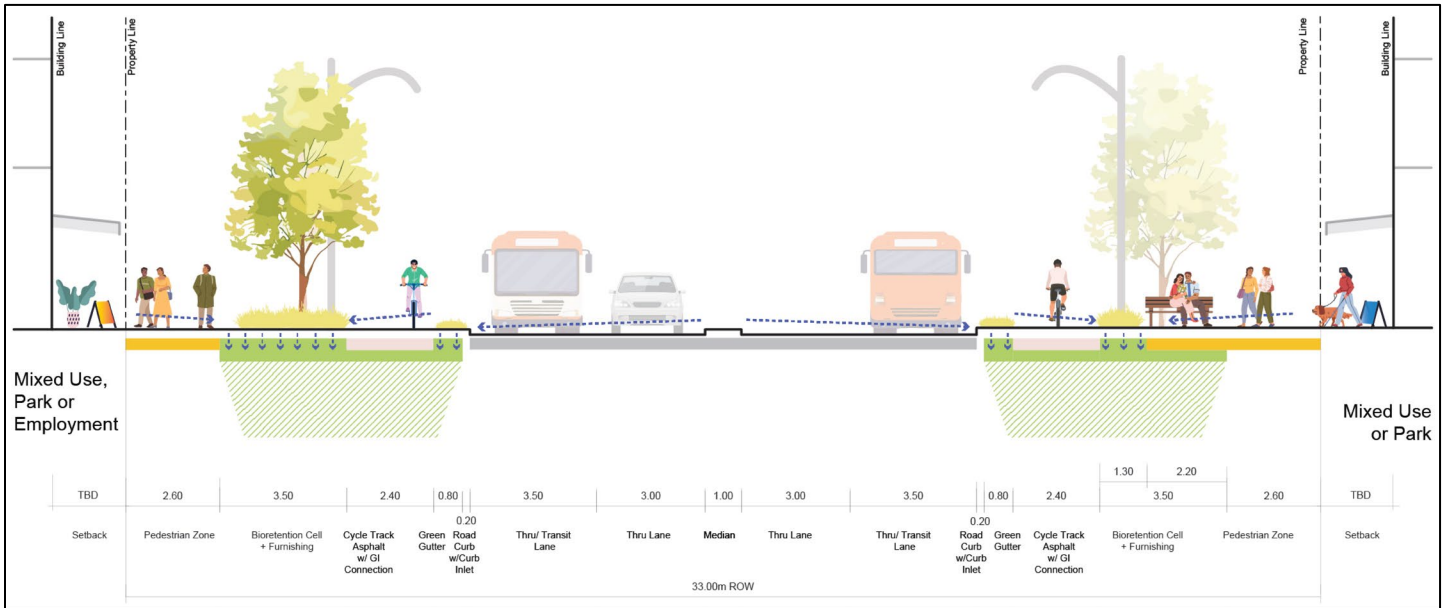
Dufferin Street (Beffort Road to Northern Street) Cross-Section - Option 1
